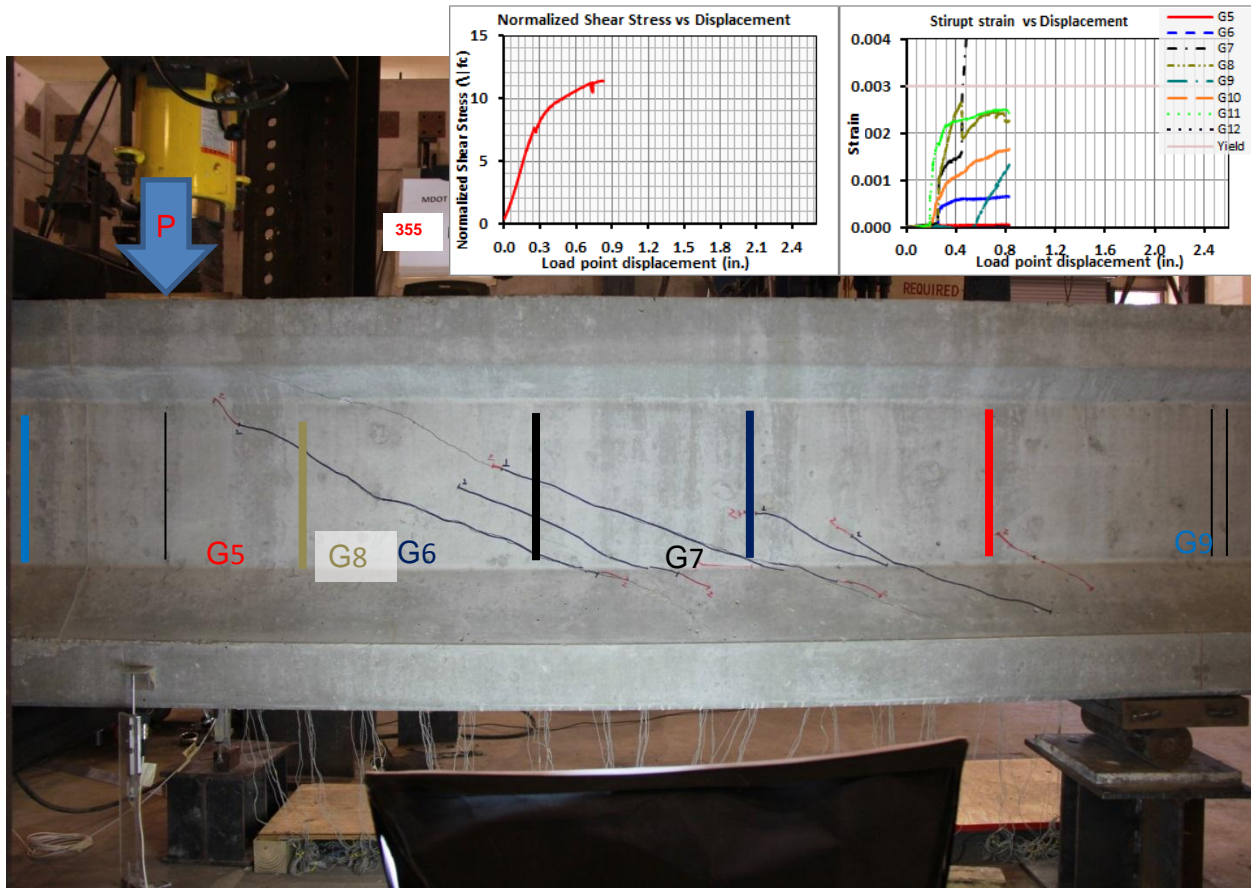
Beam 1 Test 3 Peak Load Before Failure.
